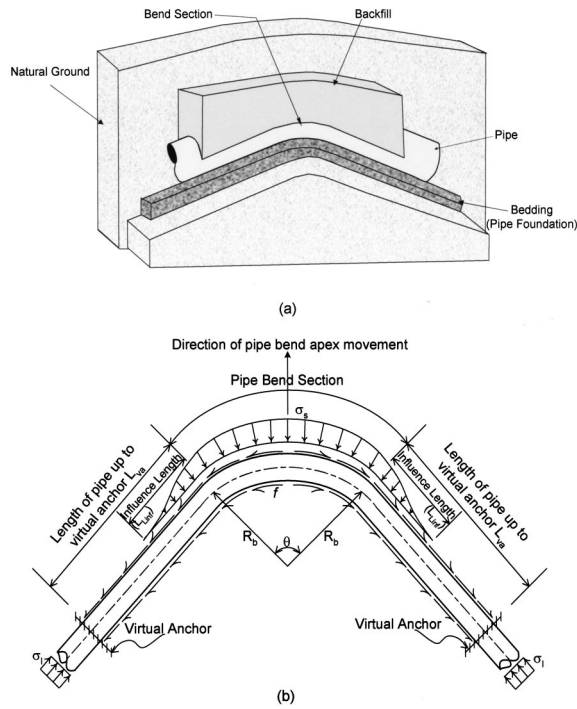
Typical vertical buried pipe bend: (a) Perspective sectional view, (b) side view showing key parameters
